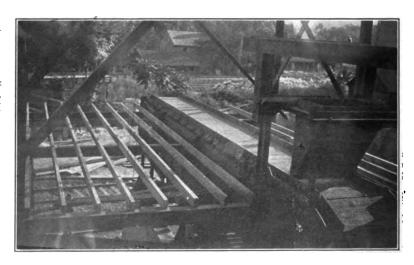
Top of Assembled Sintering-Machine before Completion of Building.
